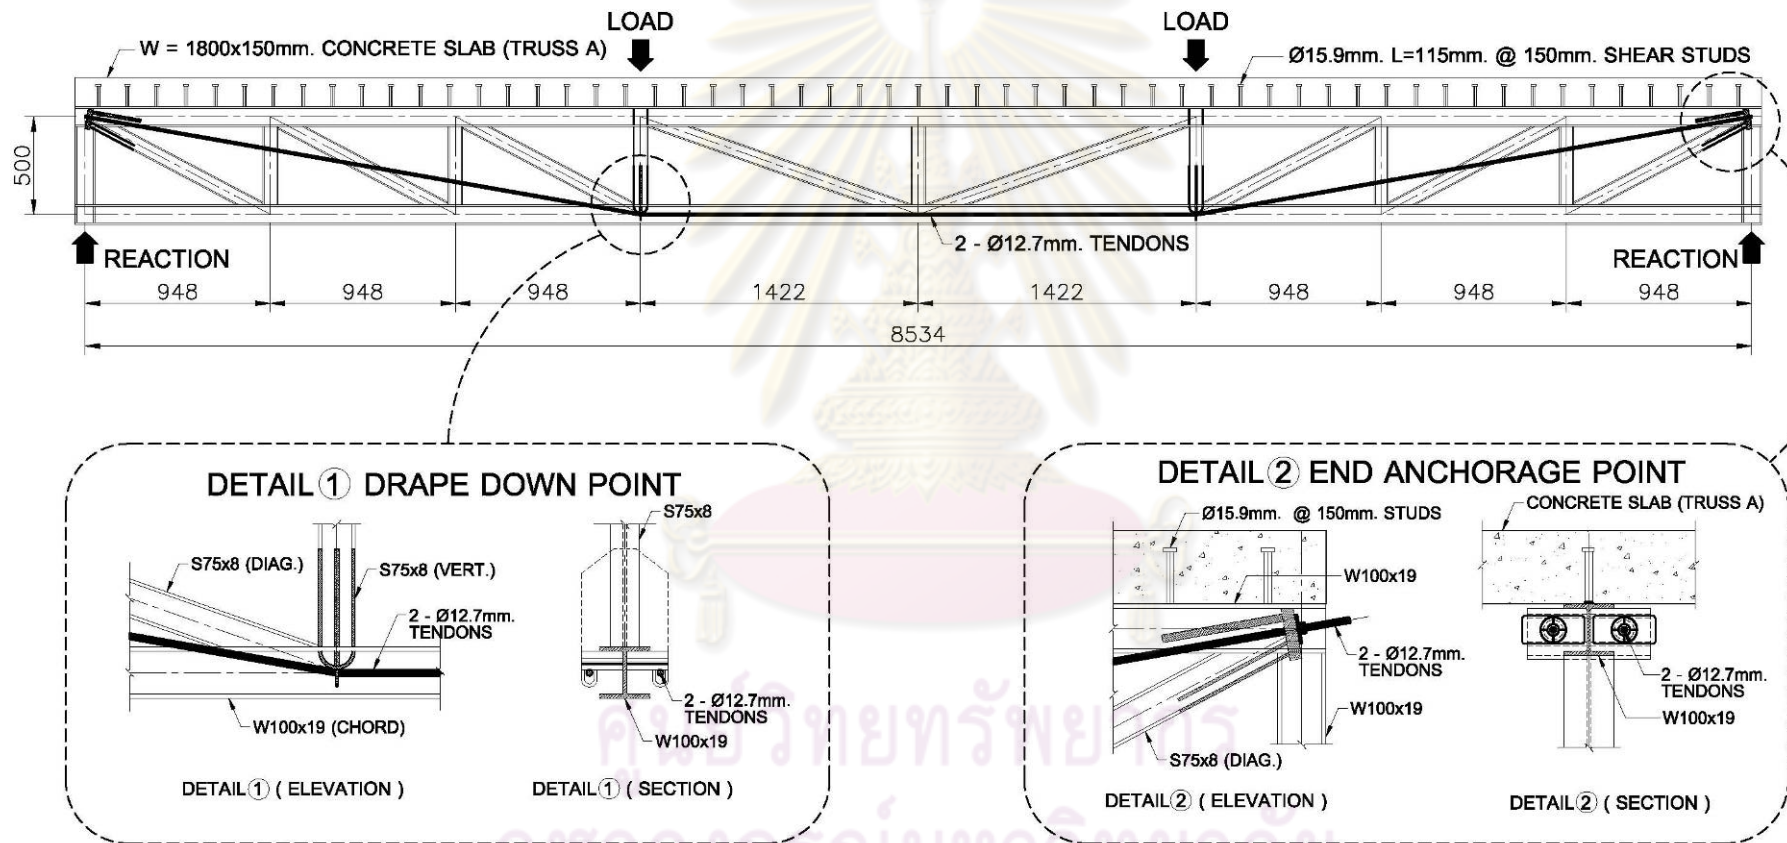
Test specimens: Dimensions with drape down points and end anchorage details
